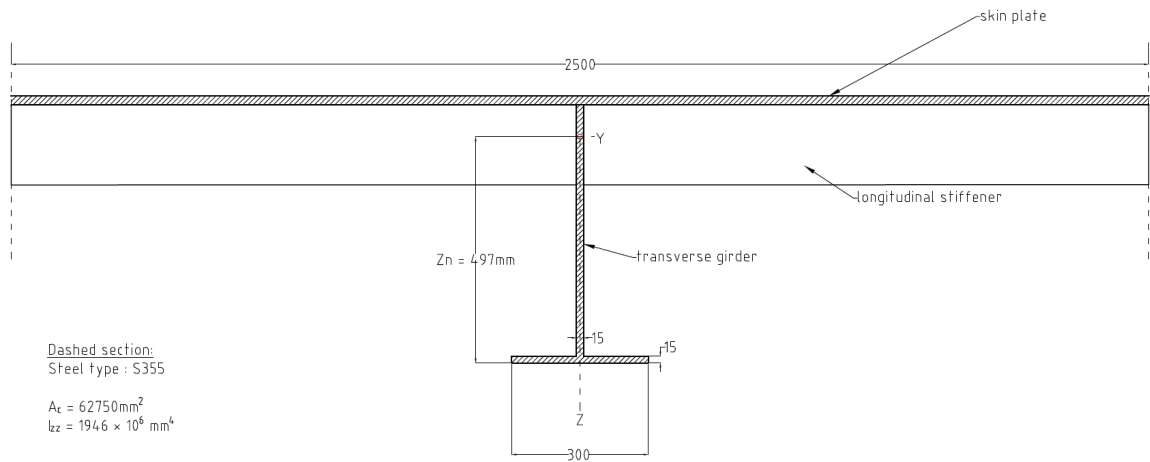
Design dimensions of the transverse girders (skin plate and transverse girder)
